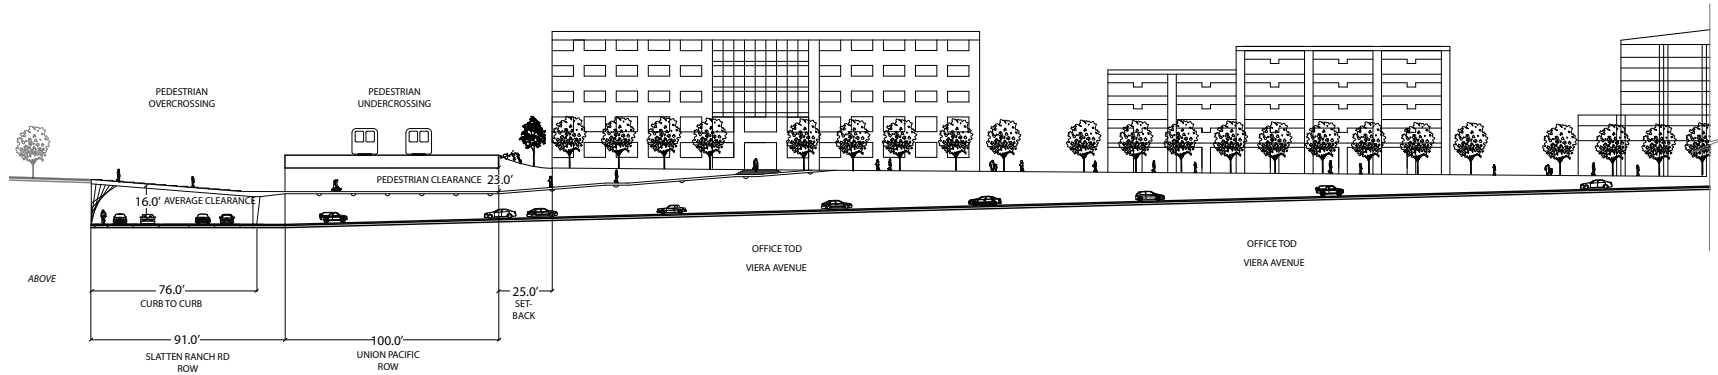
shows a detailed view of the pedestrian bridge over Slatten Ranch Road, and the straight connection to a pedestrian/bicycle walkway under the railroad. With the proposed undercrossing, there is an opportunity to make a straight direct connection from the eBART station to the Transit Village without extensive stairs, switch-back ramps, or elevators.
